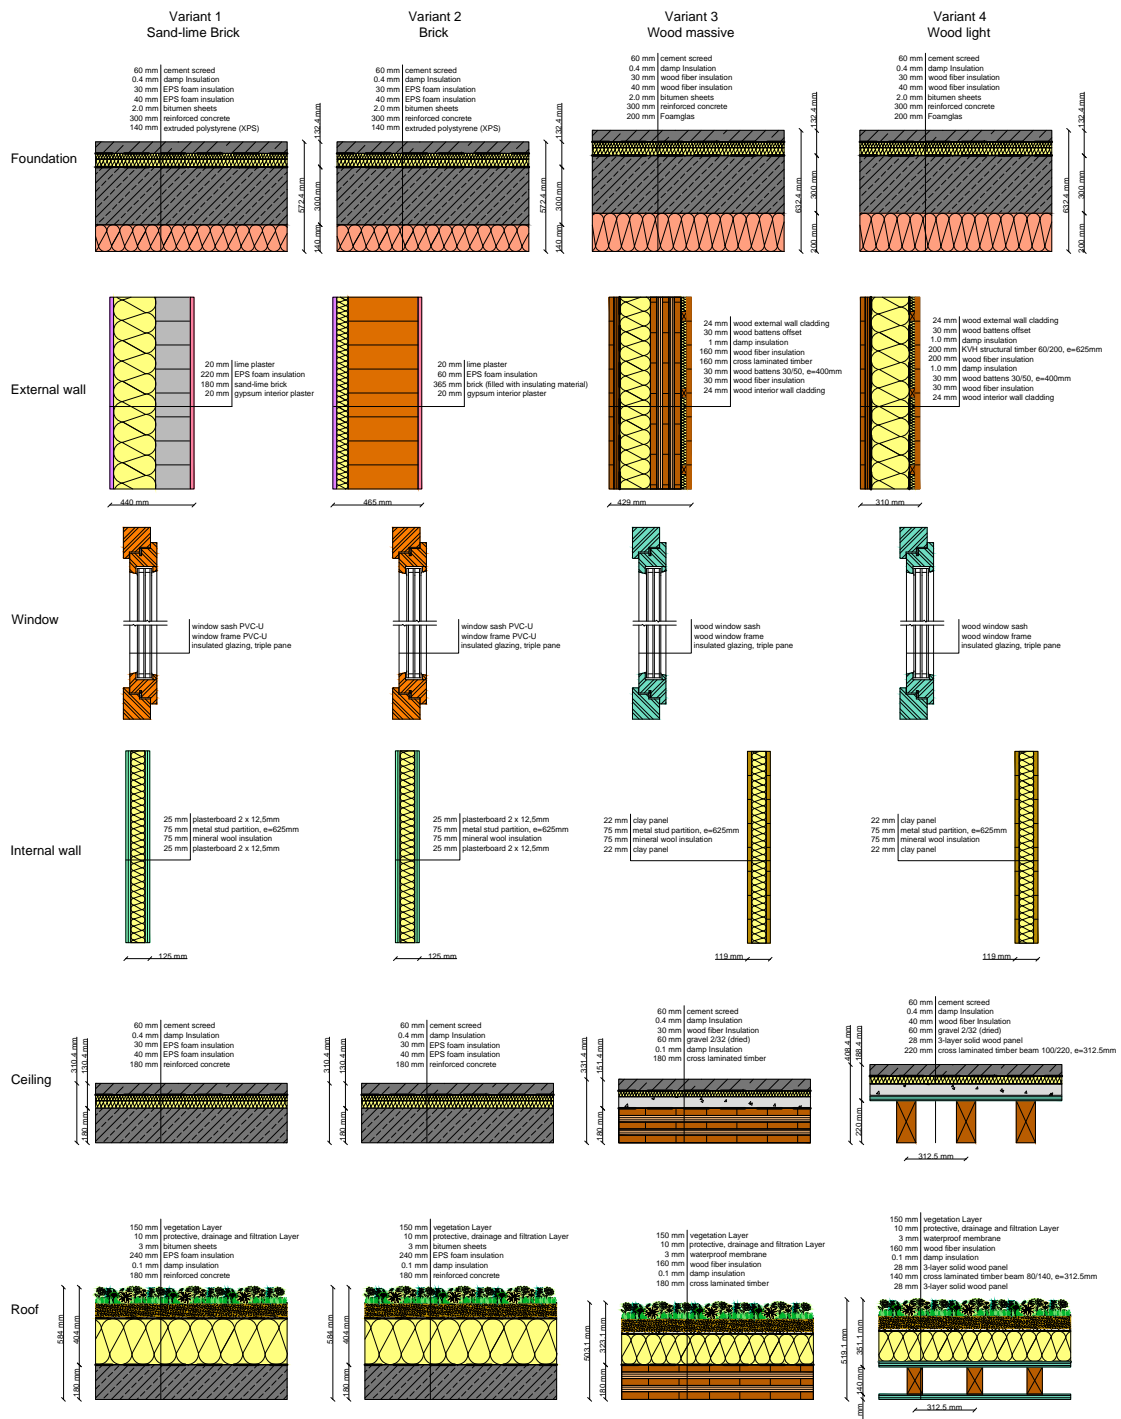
Cross section of six building components under different building construction systems: sand-lime brick, brick, wood massive and wood light.
